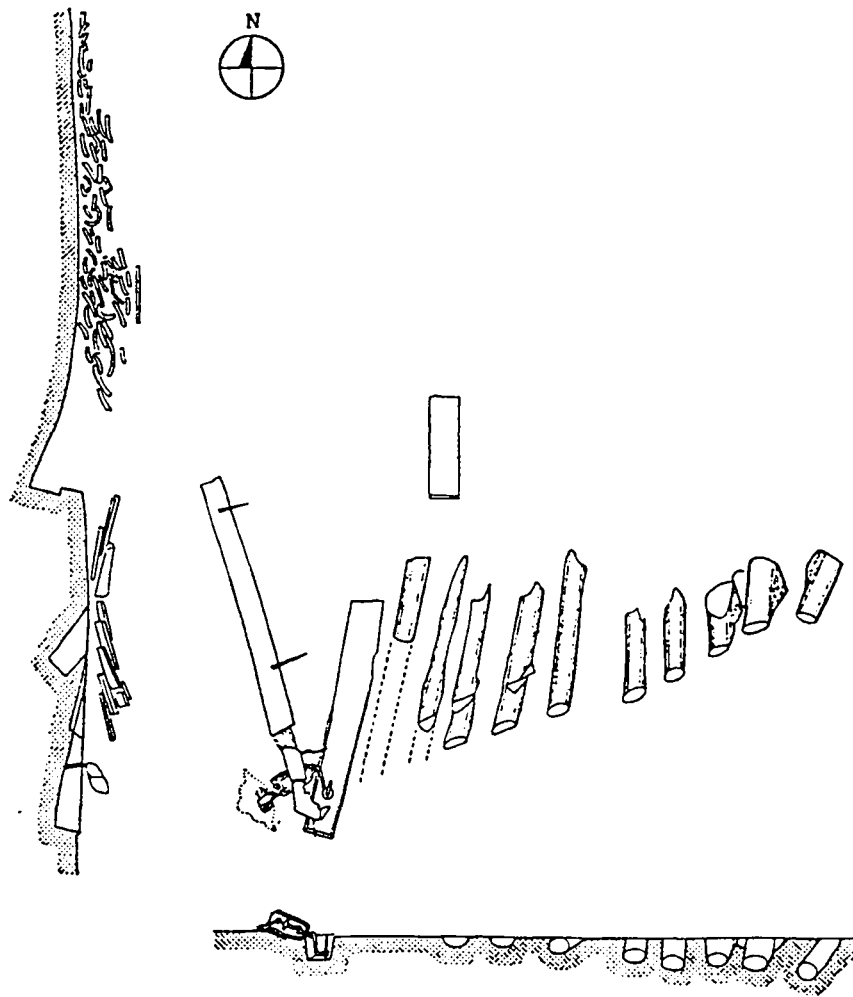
Excavation plan and sections of the fan rafters of the lecture hall of Shitennō-ji 四天王寺してんのらじ 사천왕사 (6th - 7th C. AD, scale: 1 : 50) (after: PARENT (1983), p. 54)
